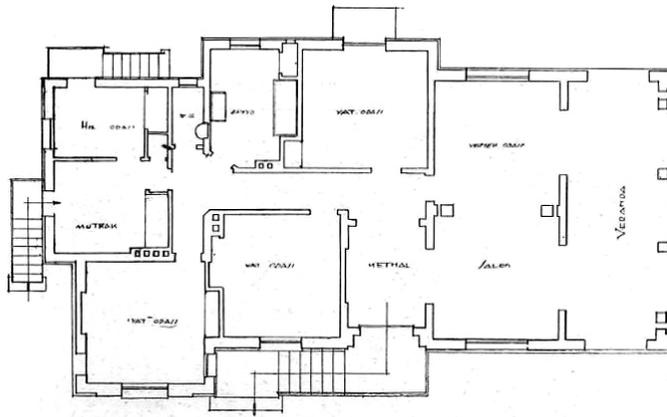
Floor plan the house in Suadiye by Vedad Tek (1932).³²⁴
